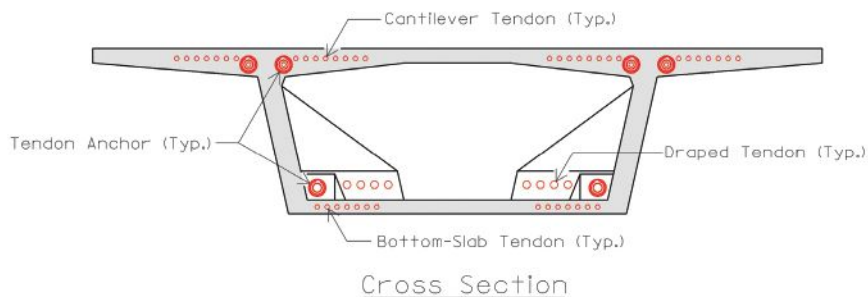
Typical cross section of post-tensioning layout for a variable-depth, balanced-cantilever bridge.
